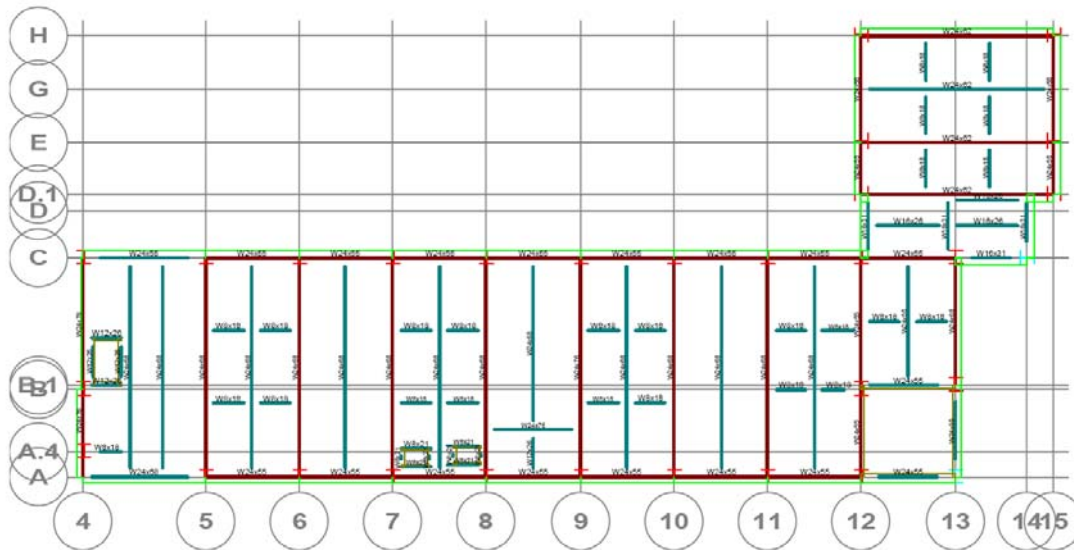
Typical Framing Plan (Lateral Elements Shown in Red)
